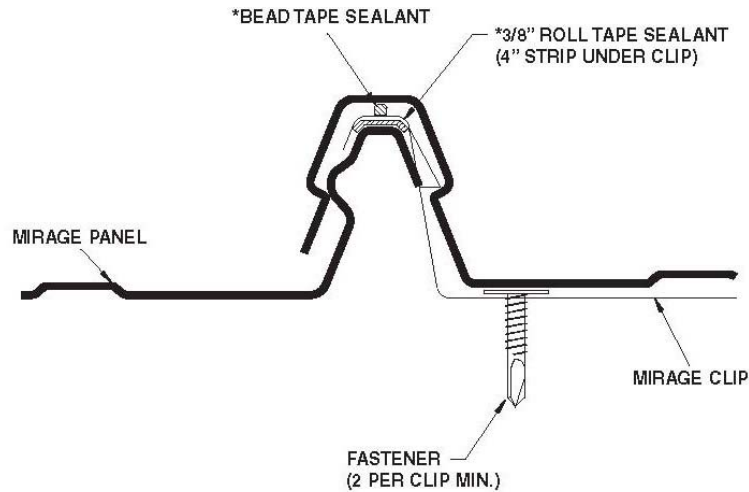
MIRAGE SIDE LAP DETAIL
